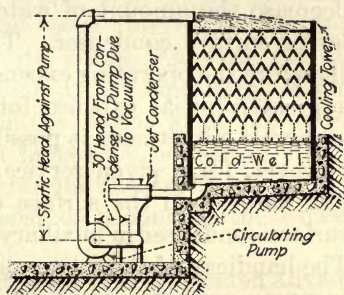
Showing Pumping Head Of Jet-Condenser Circulating Pump.
